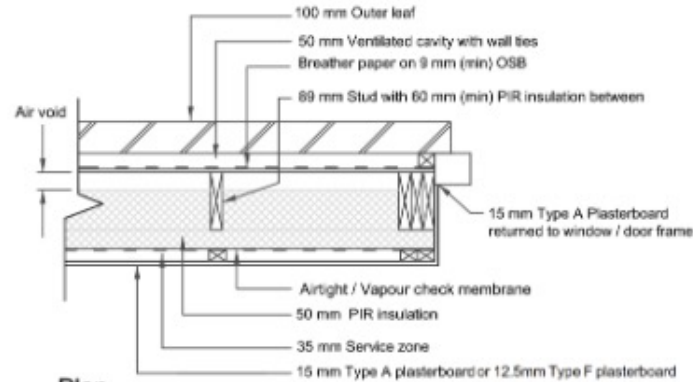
Wall Type 3 (WT3) - Service Cavity Wall
